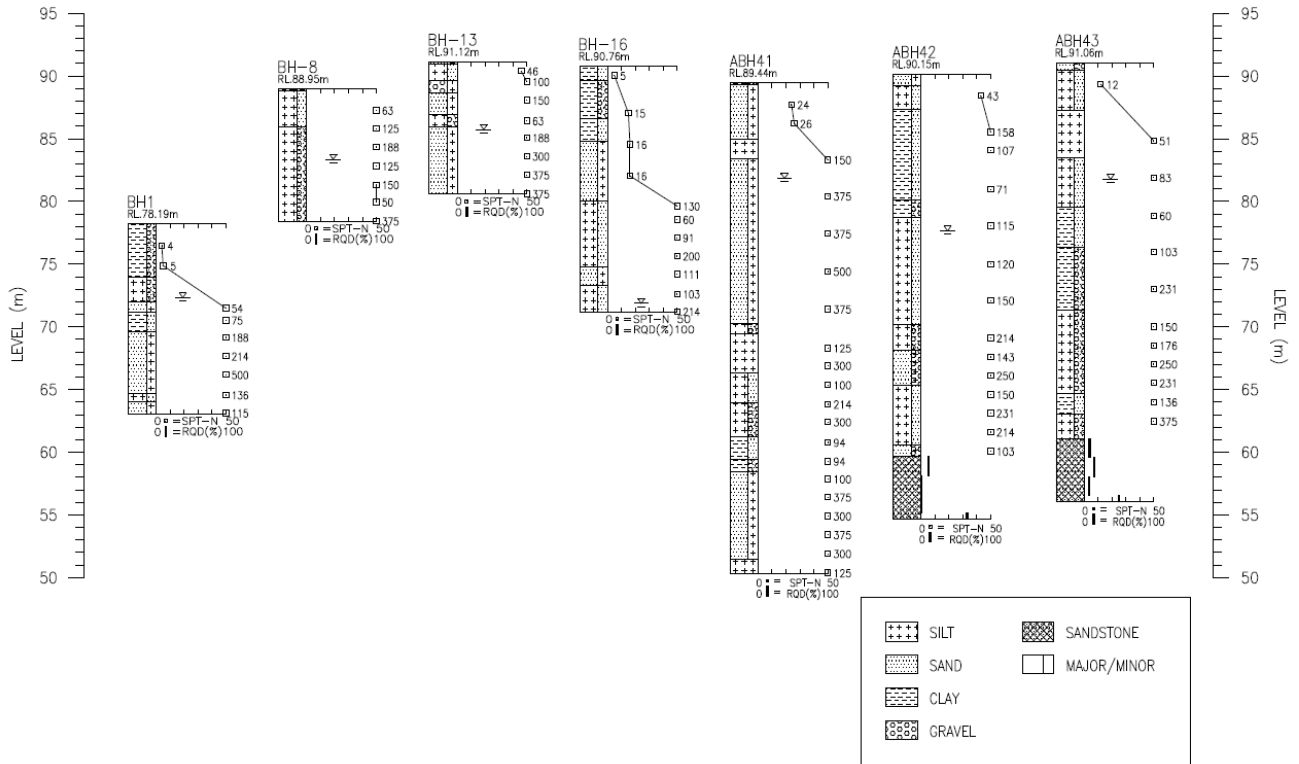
Typical simplified borelog profiles at Northern part of the site with soil nail wall up to 30m high.
